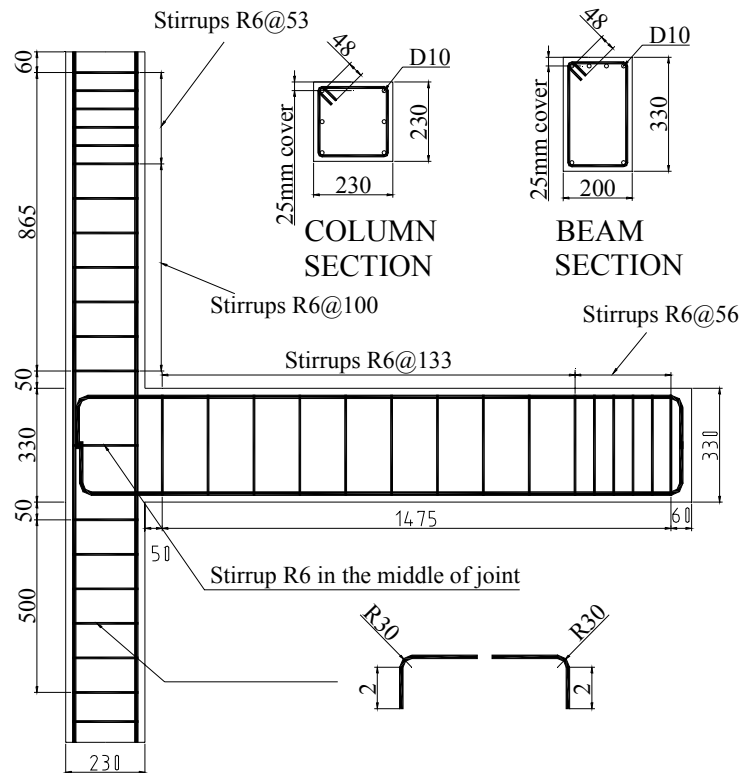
Dimensions and reinforcement details of the as-built specimen TDD1
